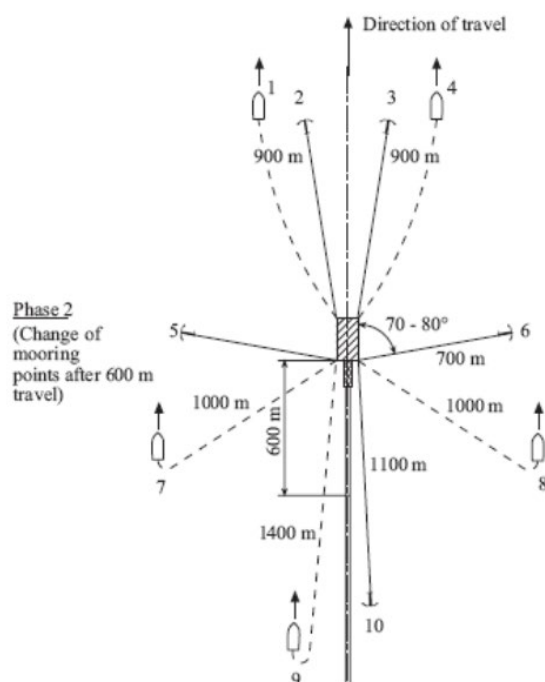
Example for a typical position mooring system in abt. 100 m water depth (after 600 m travel)
